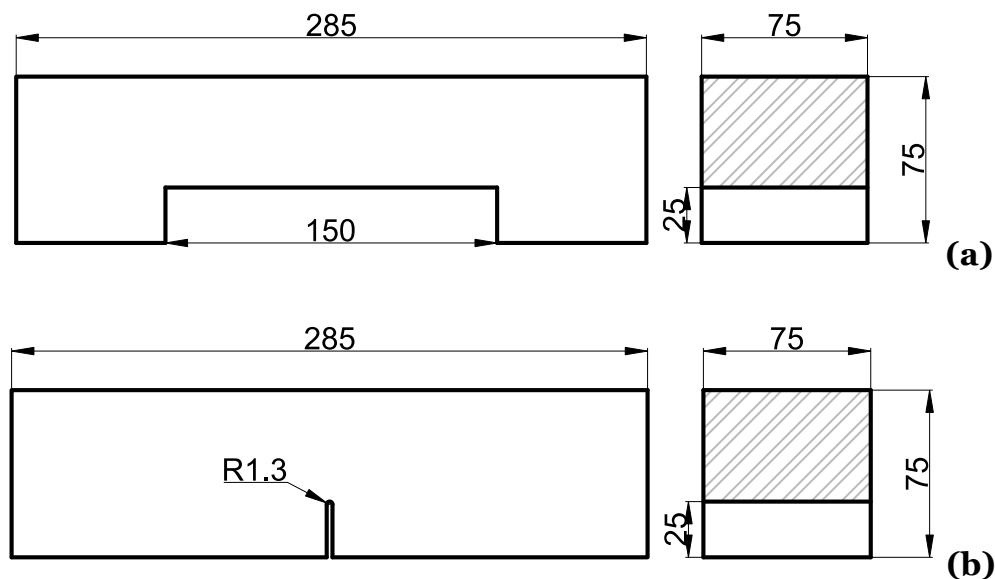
Dimensions of the un-notched (a) and notched (b) specimens tested under 3PB (dimensions in mm).
